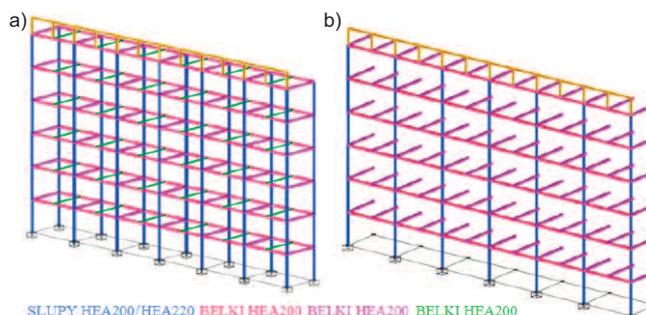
Structural designs of winter gardens: a) design 1; b) design 2
